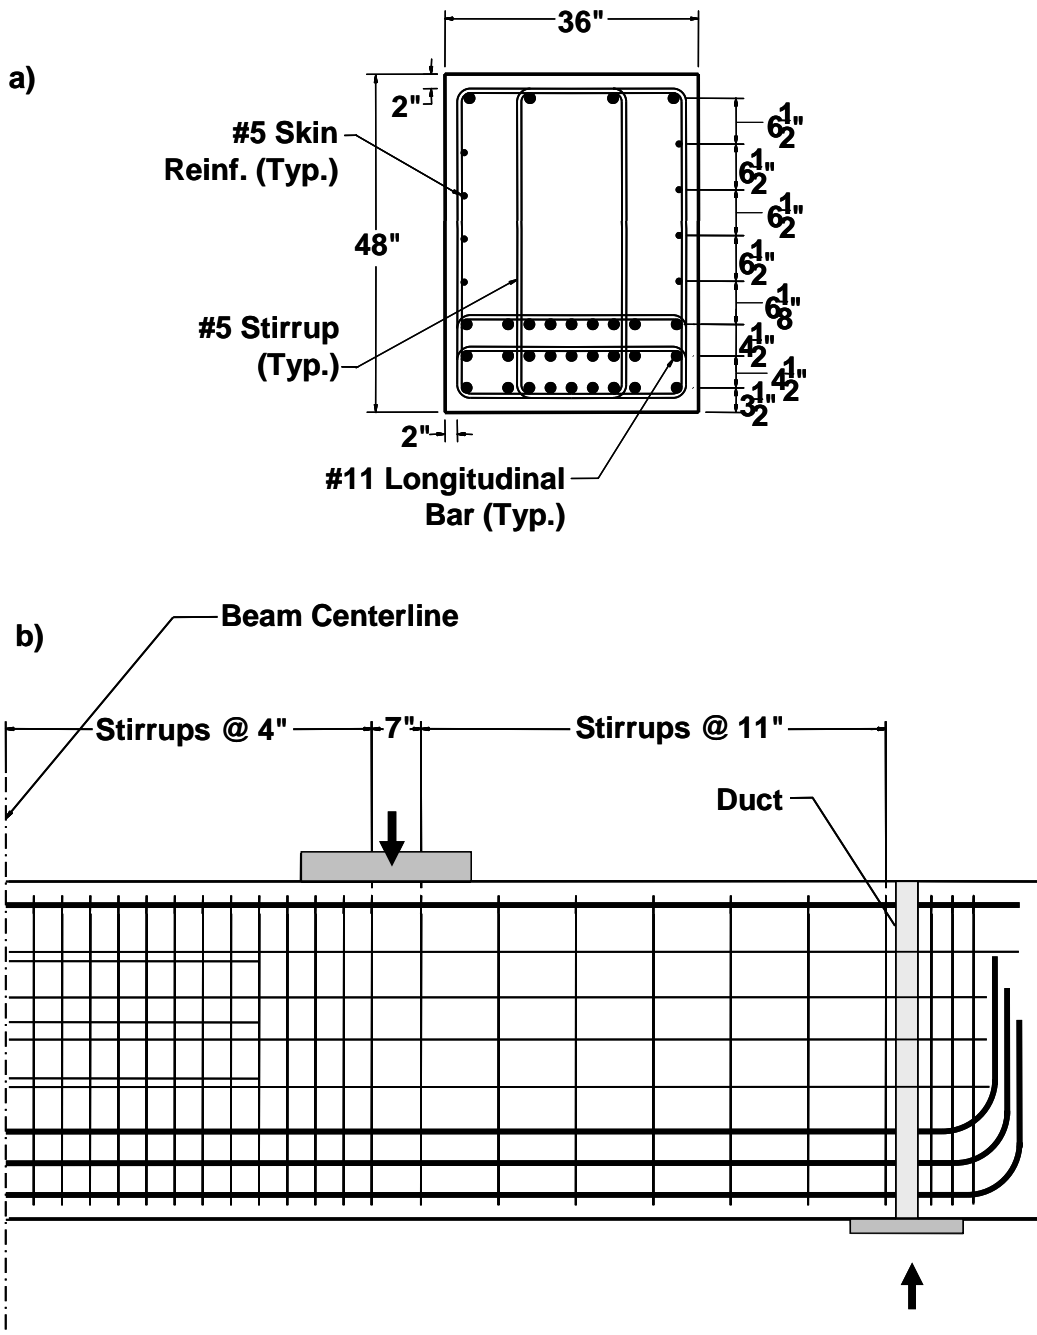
Shear span 3B a) Cross-section; b) Elevation
